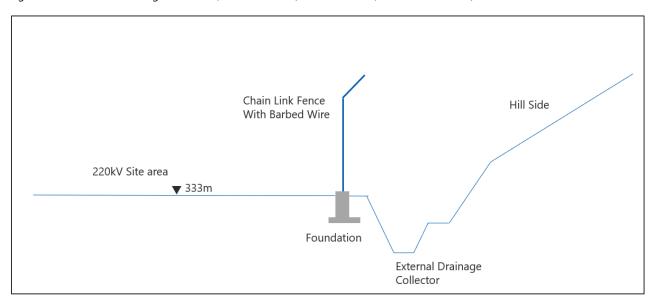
External drainage collector (hill side) cross-section (sketch not to scale)
